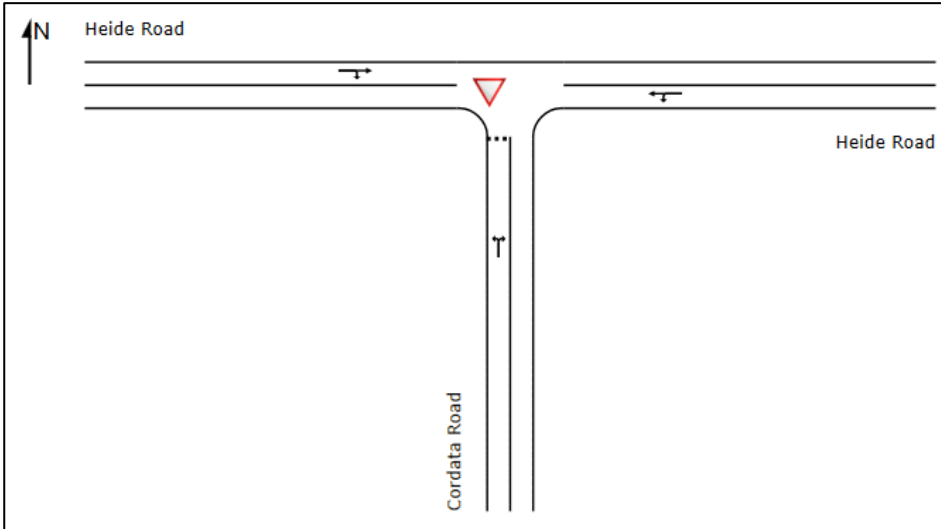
Existing Intersection Layout: Heide Road and Cordata Road
